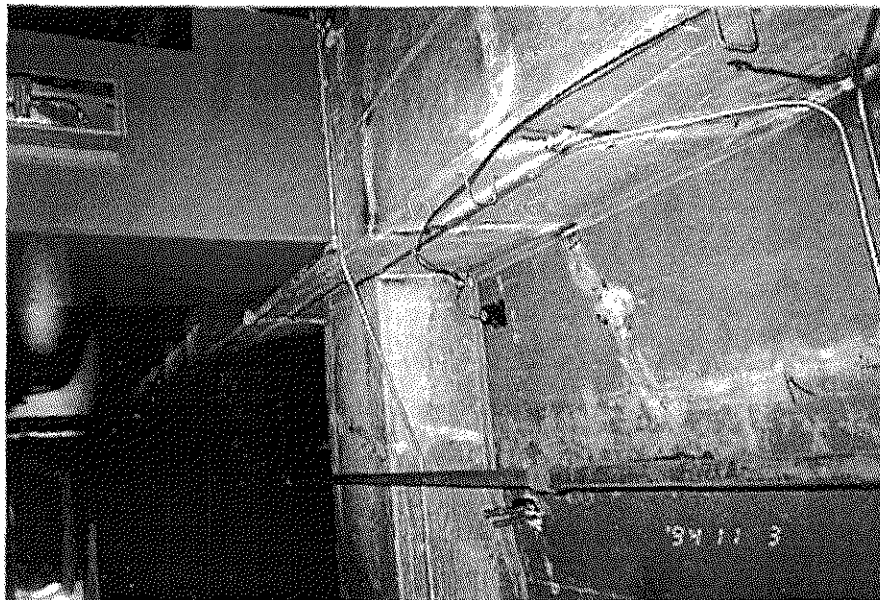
Damage to girder, column and wall (Repaired with epoxy) (Naeim, 2000)
